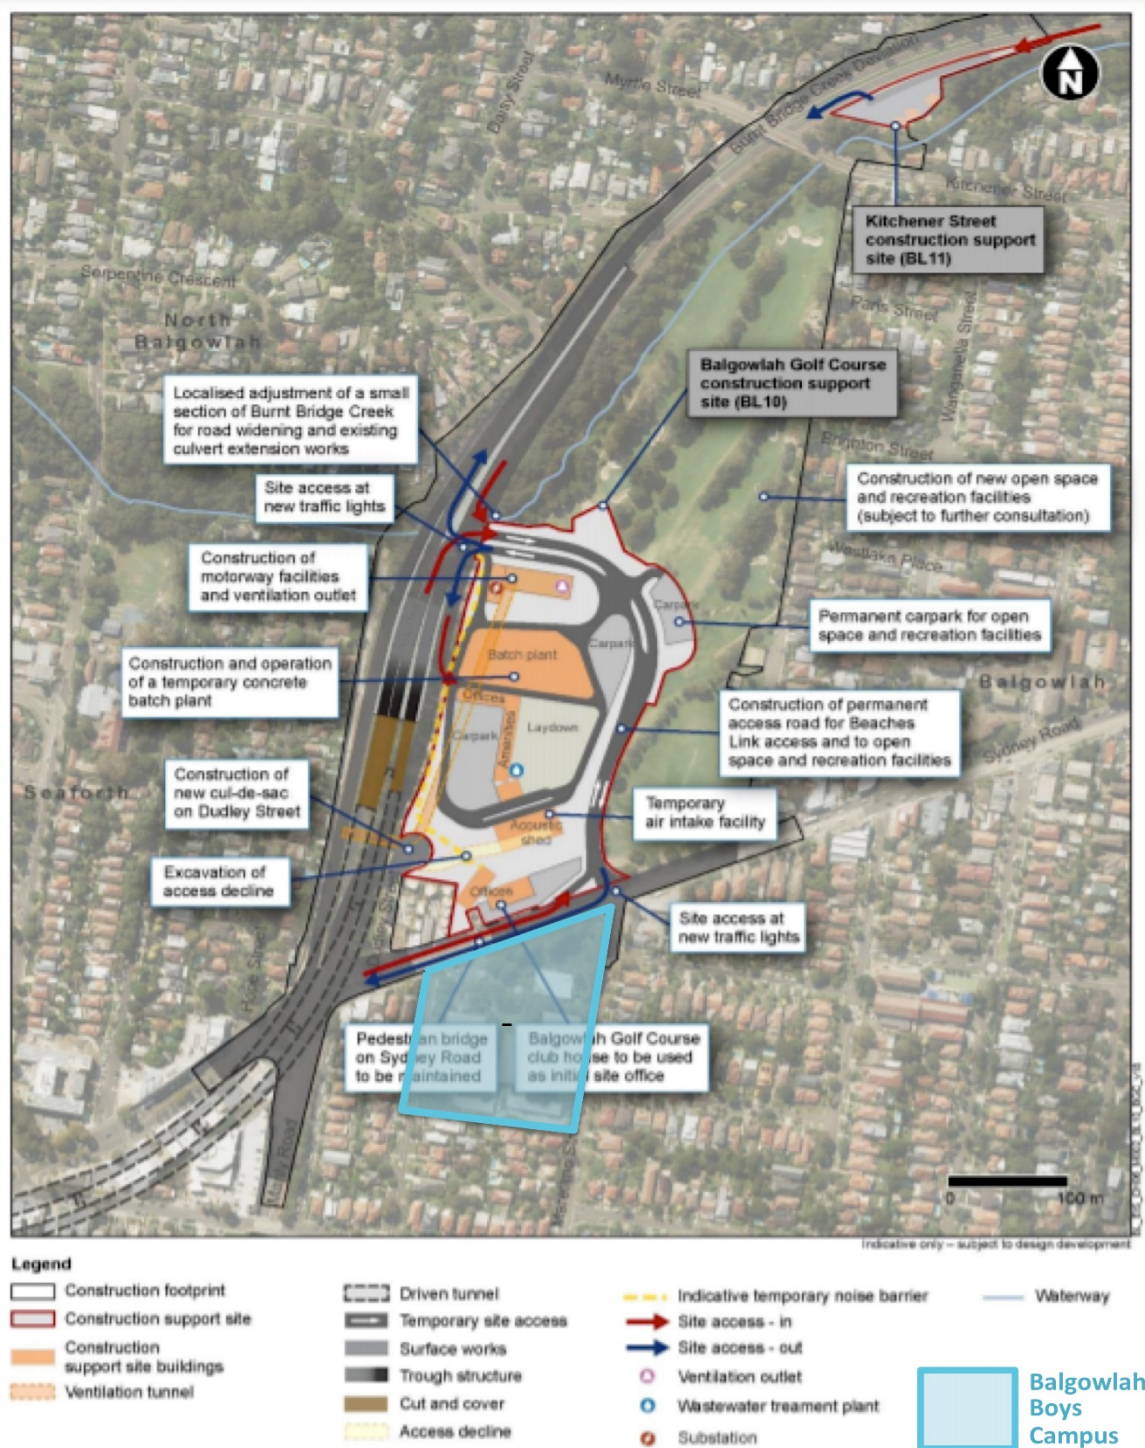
Indicative layout – Balgowlah Golf Course construction support site (BL10)
